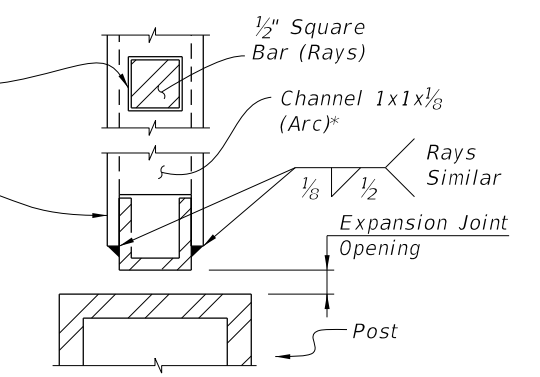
A" INTERMEDIATE RAIL/RAY CONNECTION
